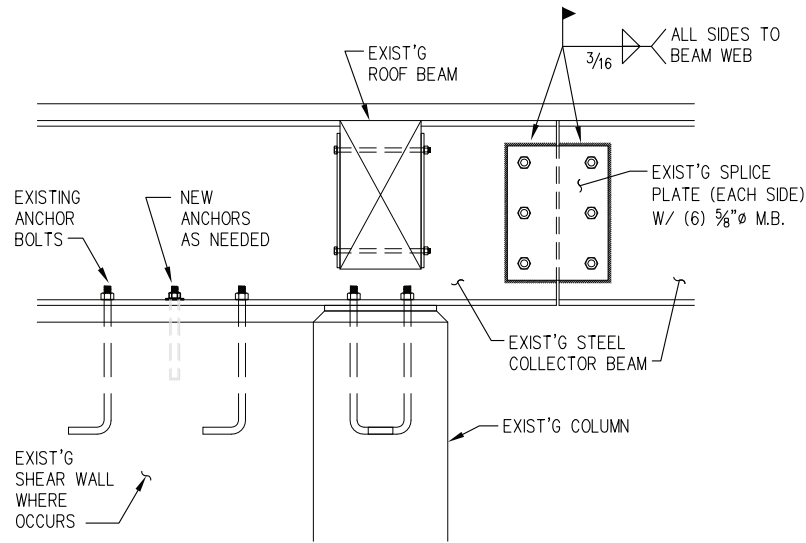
F: ELEVATION: EXISTING STEEL BEAM AT COLUMN AND SHEAR WALL
